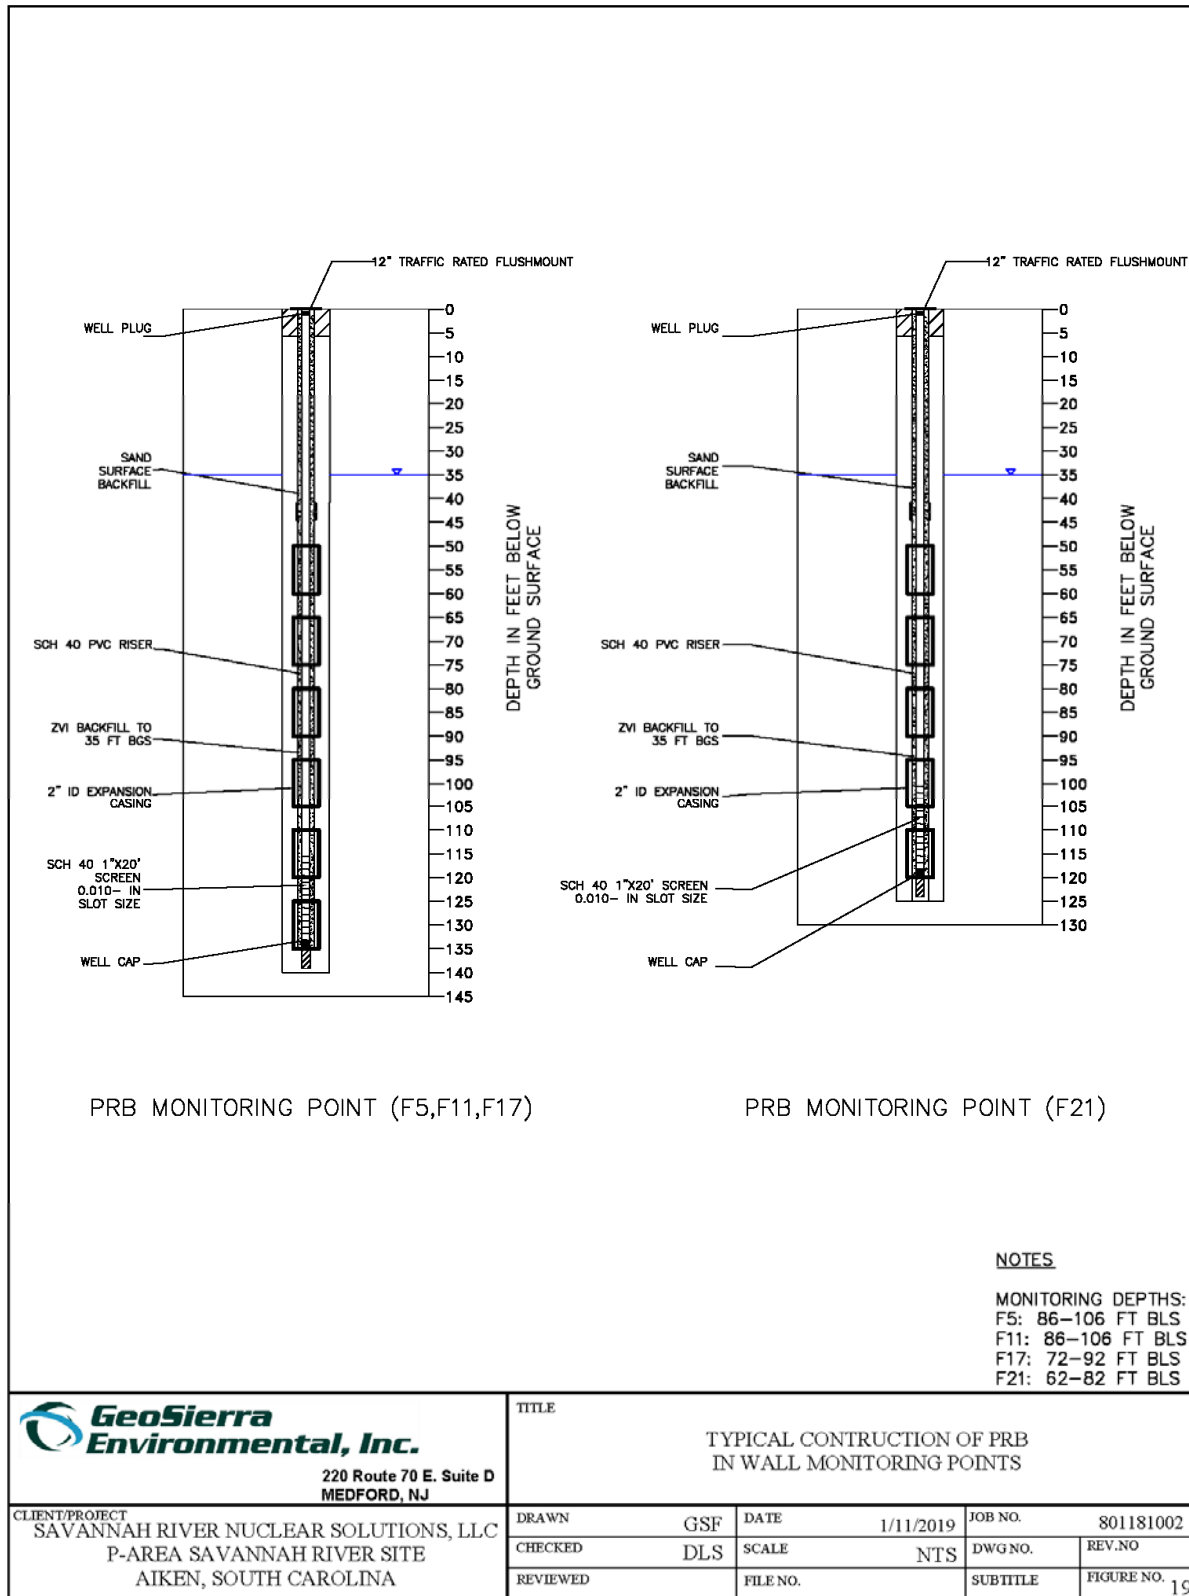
Typical Construction of PRB In Wall Monitoring Points
